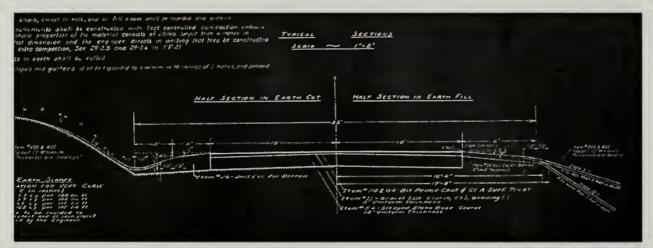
Cross-section diagram for Day Mountain Road Extension, 1950, showing a 32-foot cross-section that includes a 20-foot traveled way, a 3-foot shoulder in cut, and a 6-foot shoulder in fill. (U.S. Department of Commerce, Bureau of Public Roads, Project 9A2, Sheet 2 of 11, November 1950)
